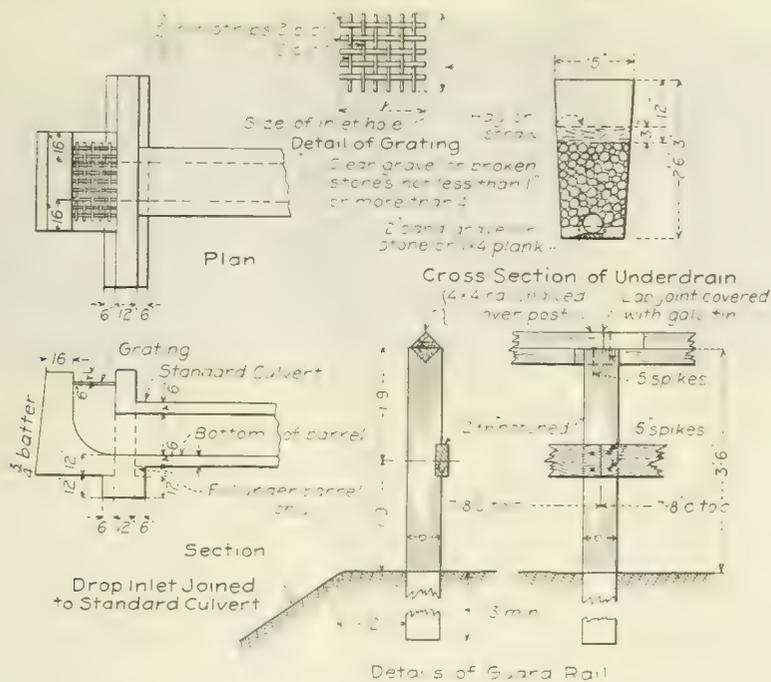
Details of Guard Rail, Underdrain and a Drop Inlet.
